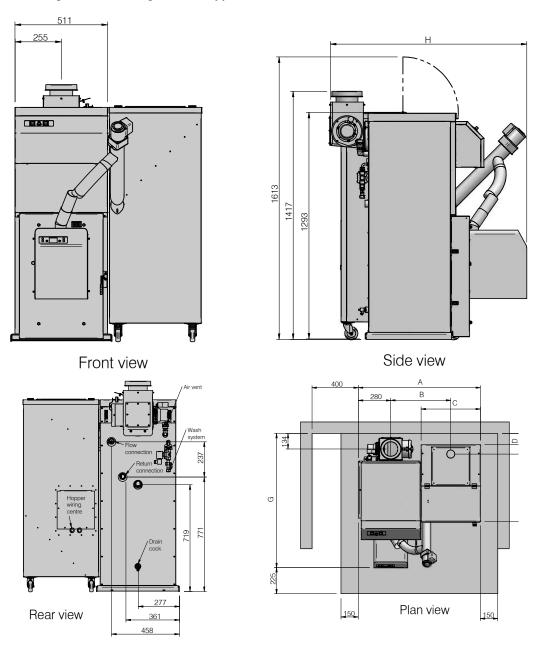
Boiler and hopper dimensions and clearances – single boiler with right hand hopper
